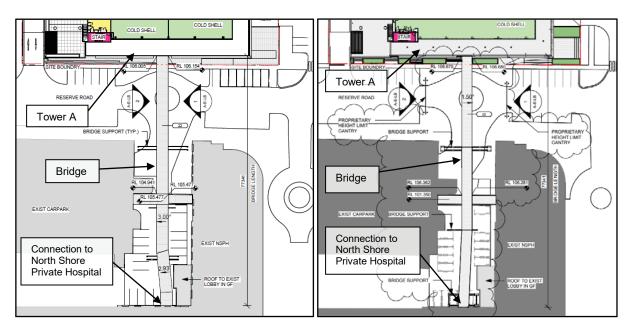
| Approved (left) vs Proposed (right) link bridge roof
